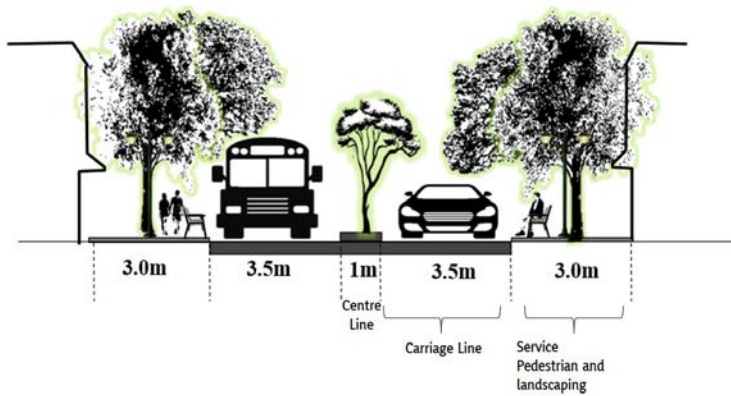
Proposed Road Section for 3rd Priority "B" Category Road
